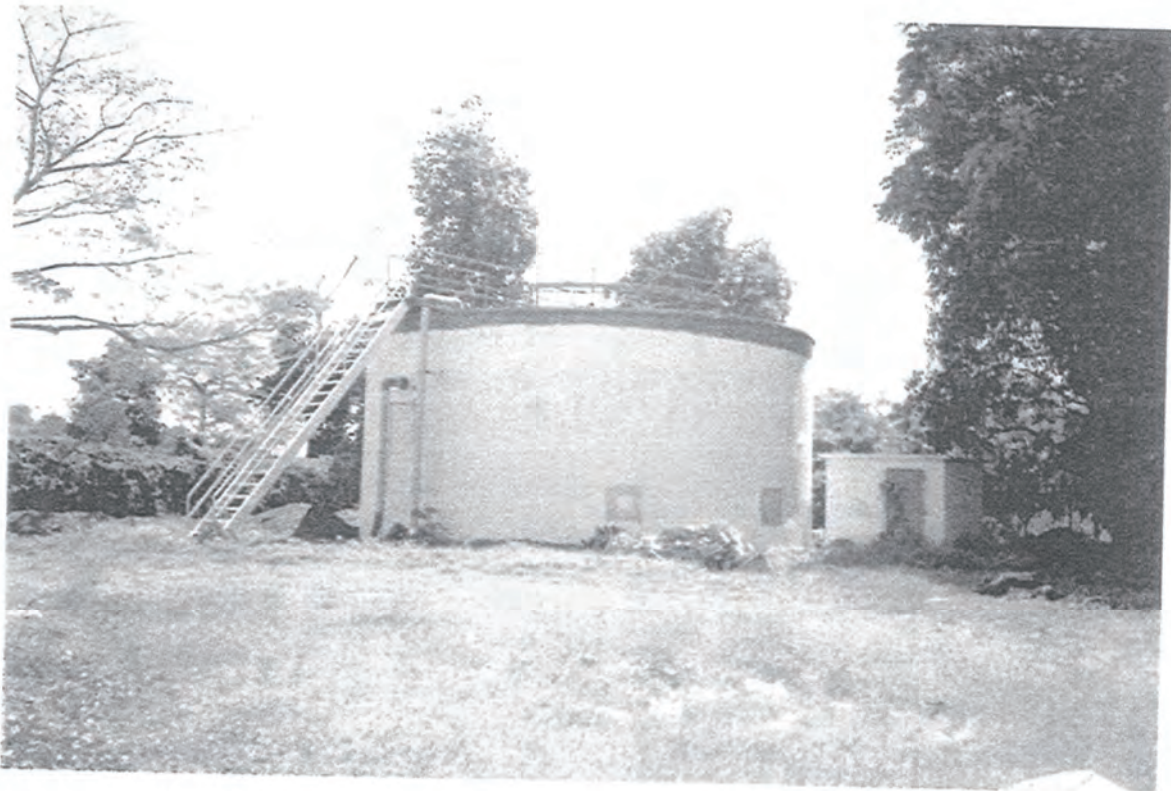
The Spanish Town Hospital Sewage Treatment Plant.
